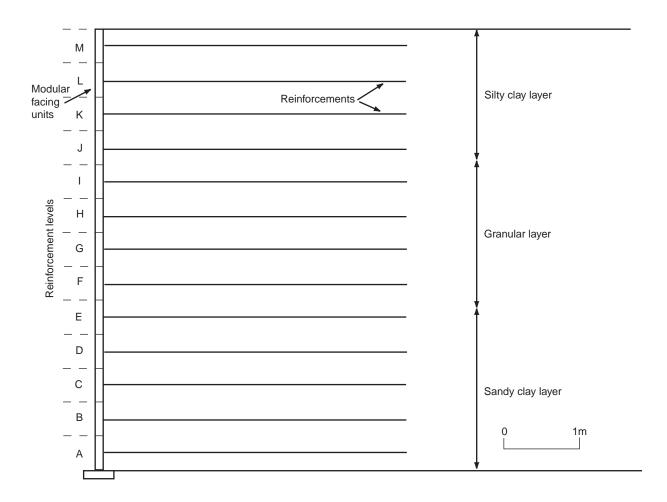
Sectional view showing levels of reinforcements at the experimental reinforced soil structure at the Laboratory
